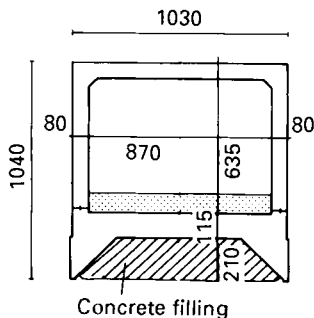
Cross section of a normal caisson for a straight, double-track running tunnel in Amsterdam
